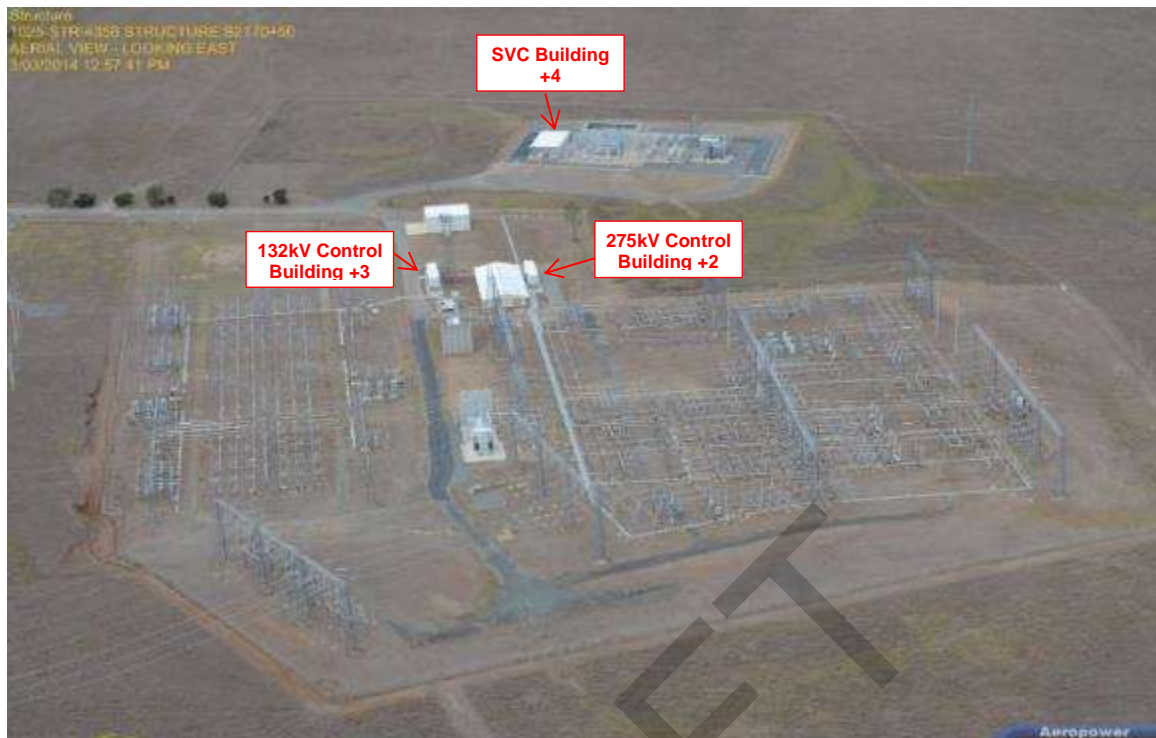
132kV/275kV Woollooga Substation and SVC Aerial View
